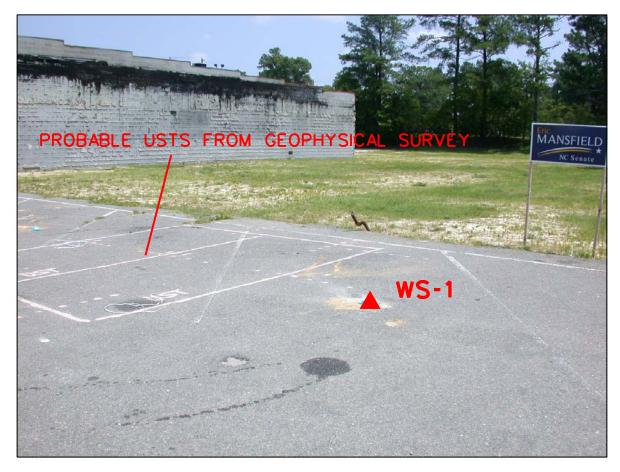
BORING IN PROPOSED R/W LOOKING NORTHEAST
